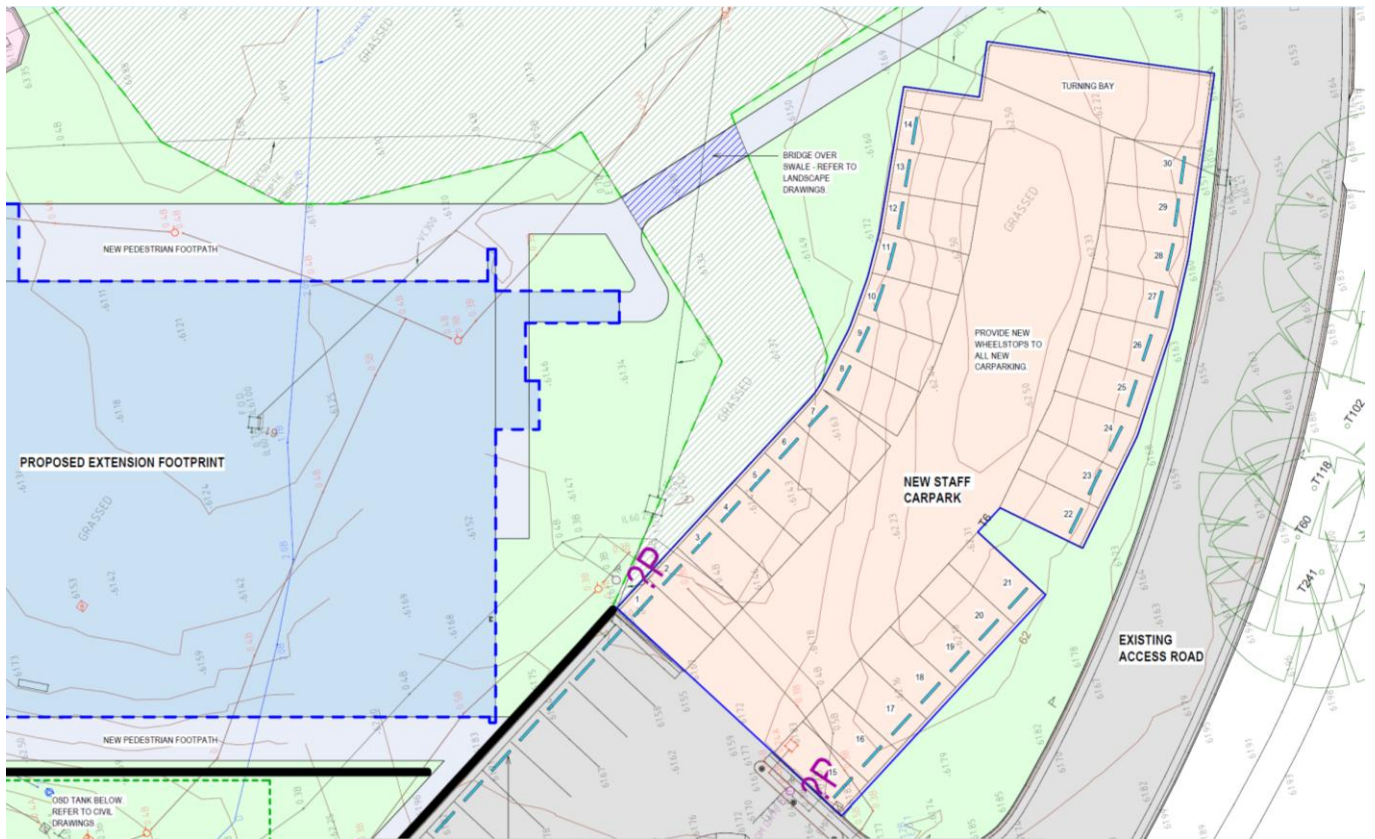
Proposed extension to existing at-grade car park P1 (Jacobs)
